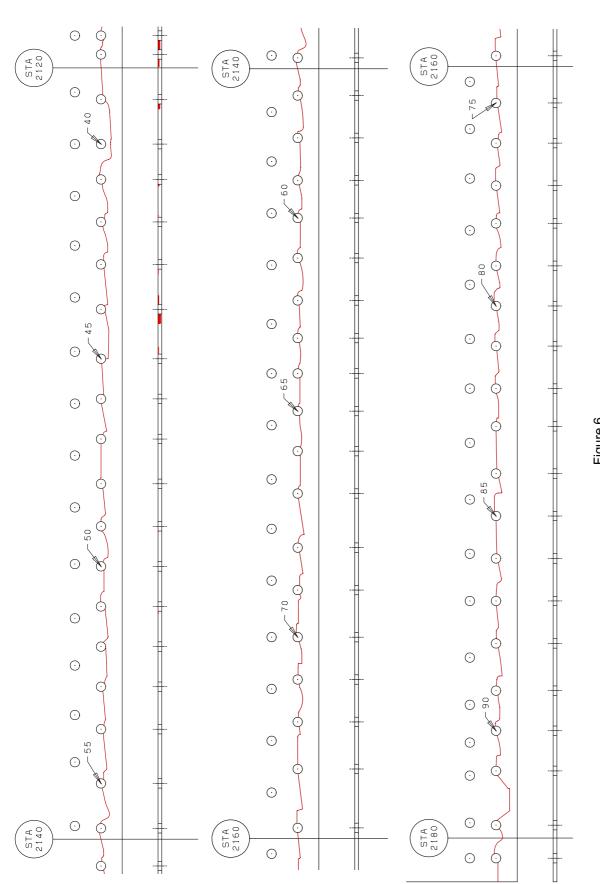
Map of fatigue cracking (red areas) observed on fracture above S-49L from STA 2120 to STA 2180. Refer to Table JVI for lengths and depths of the fatigue cracks provided in this figure.
